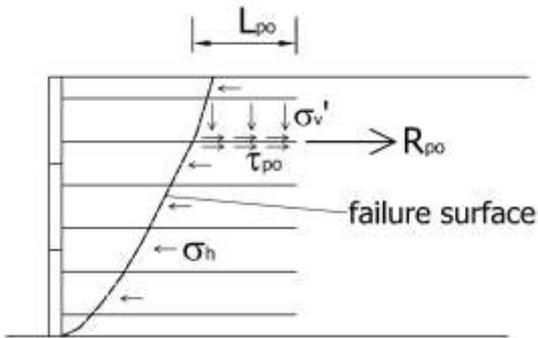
Example of pull-out analysis of a reinforced fill structure
